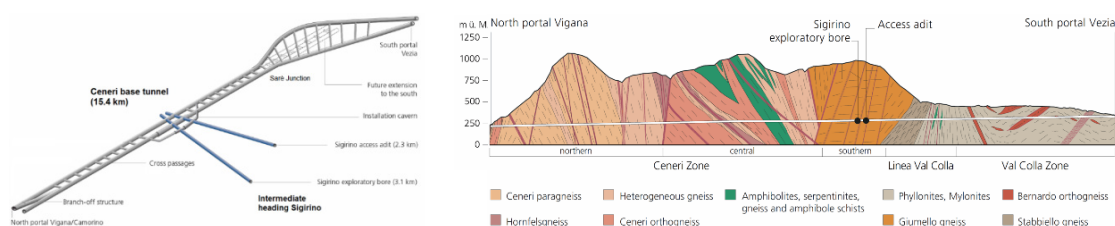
Ceneri base tunnel layout (left) and geological longitudinal profile (right).
